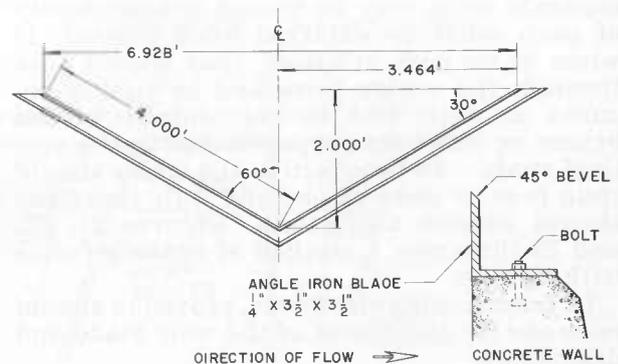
Detailed plans for a 2-foot 120° angle-iron weir blade.
